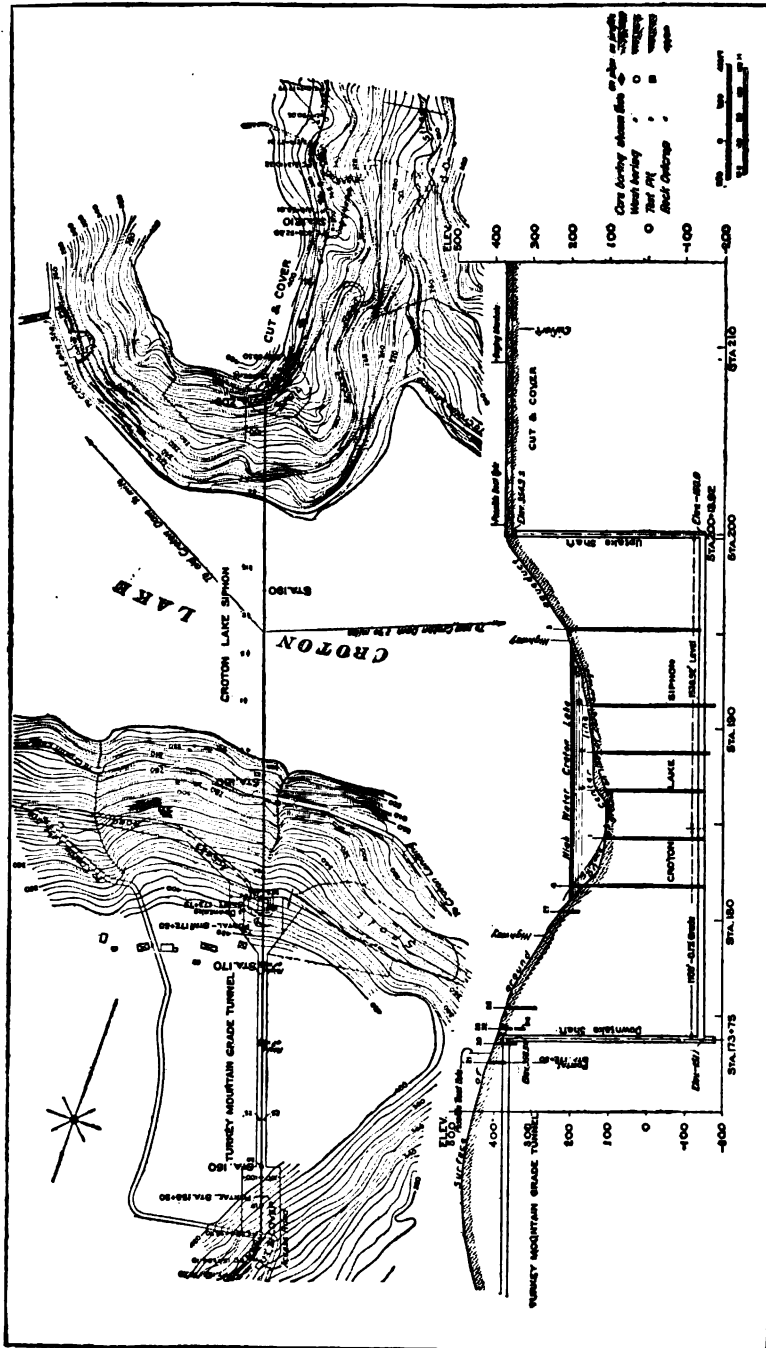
Contract 24. Croton Lake Siphon. Contour Plan and Profile of Pressure Tunnel Showing Vertical Borings, etc.
